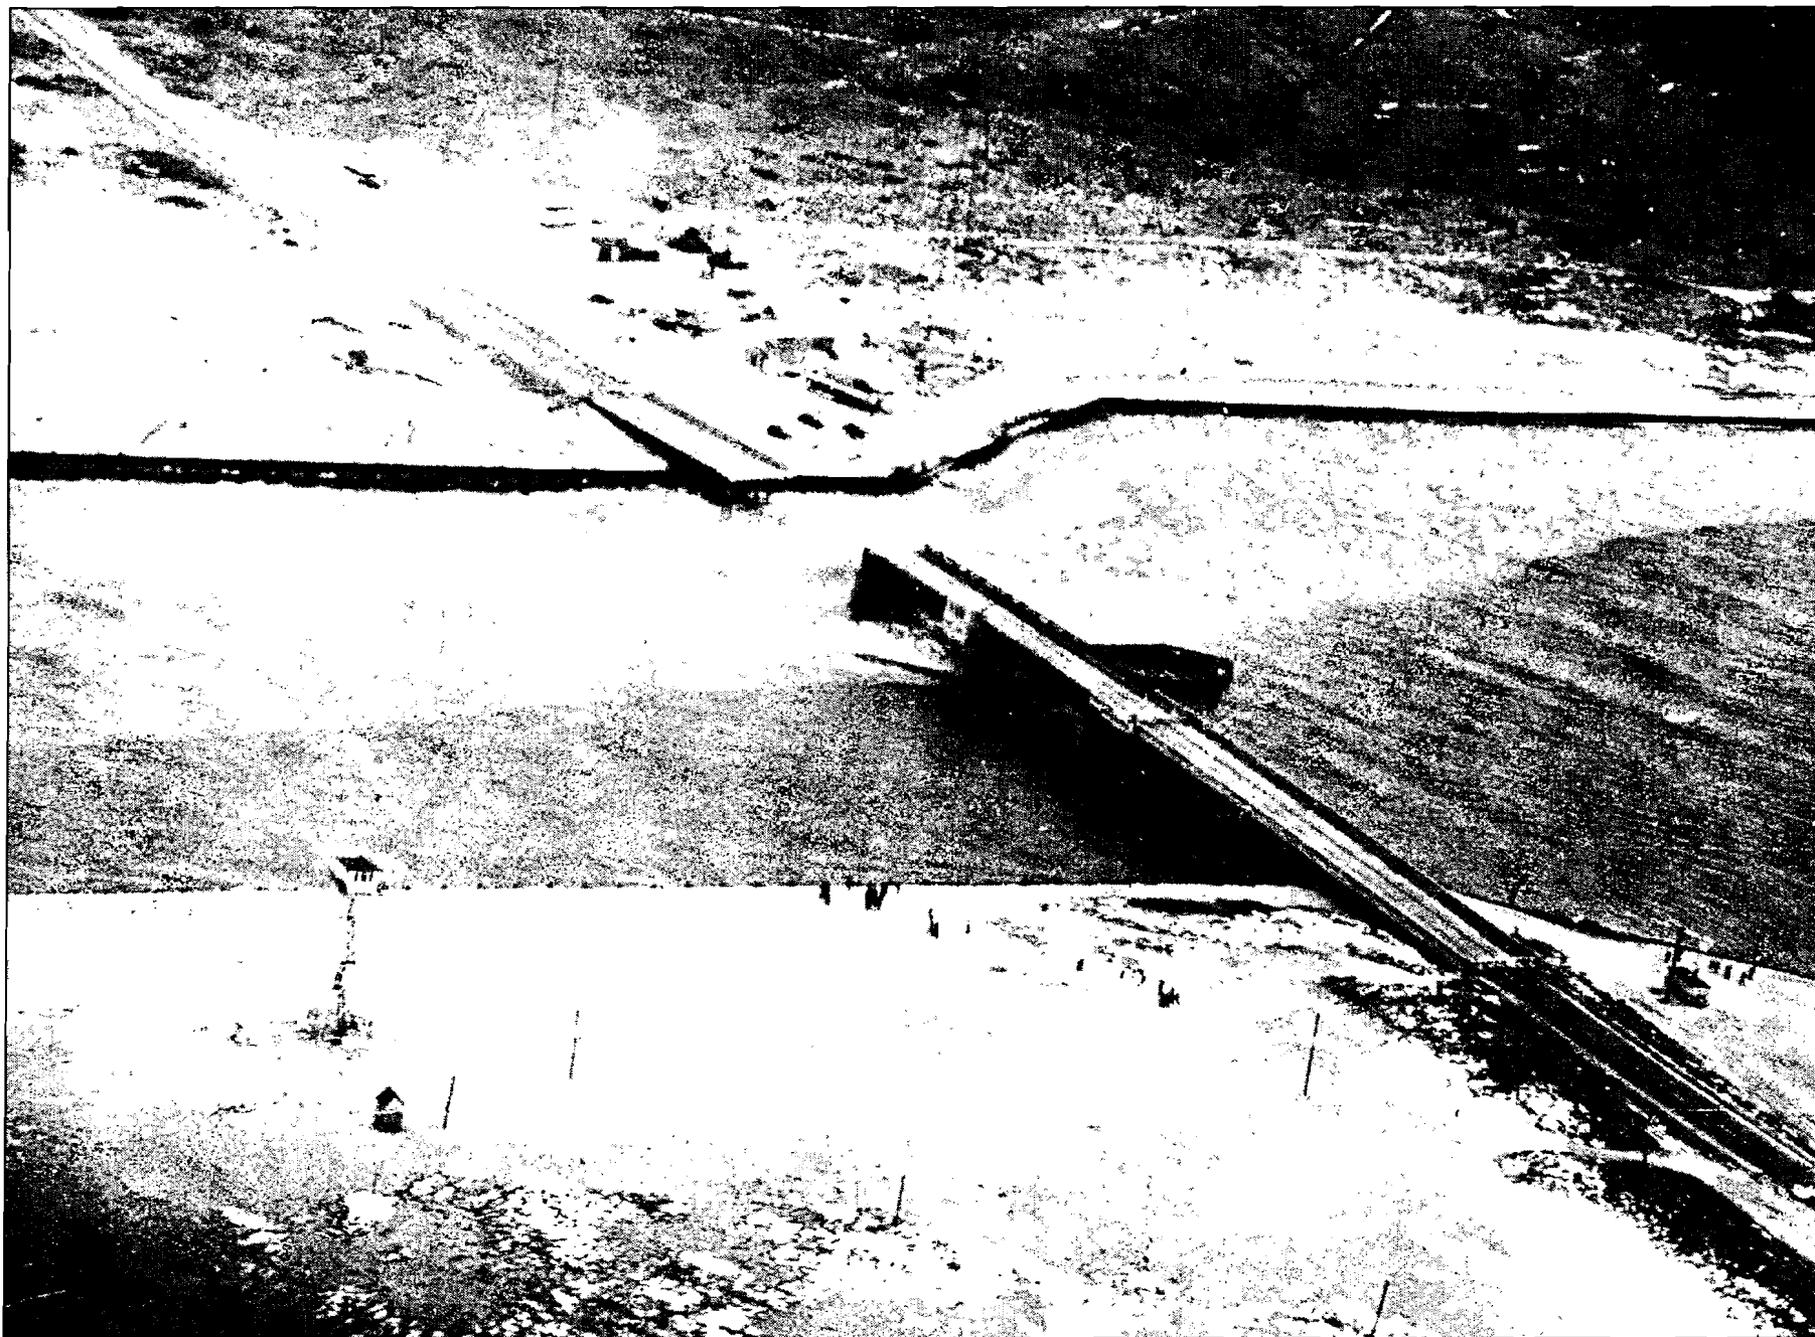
Aerial view of Cullen Bridge after destruction of south bridge trestle toward southwest. RG 1325. General Photo Collection: Transportation. Image #78pn.98136. Delaware Public Archives, Dover.
